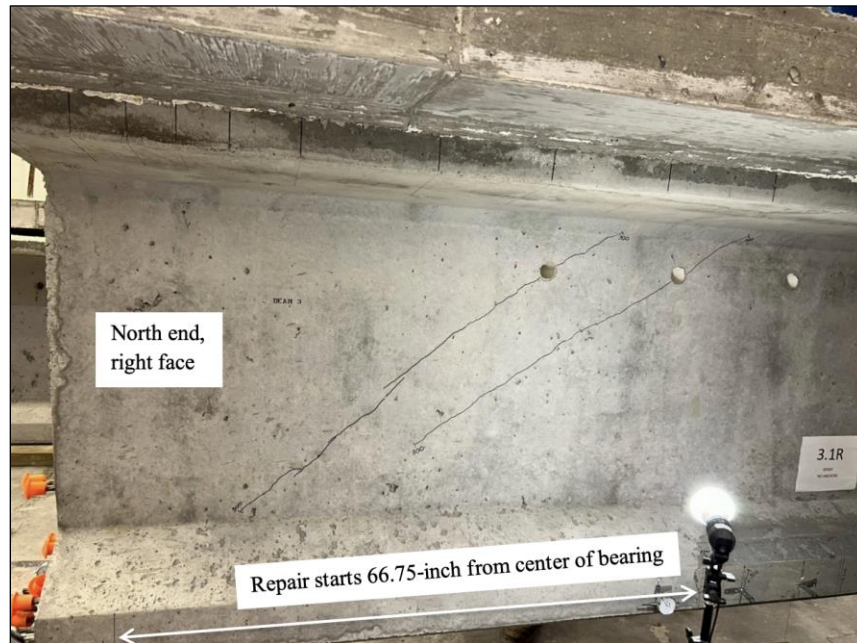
Photo. Test 3.1.S (repair 3.1RBF, 3.1LBF) initial shear cracks (right face of girder pictured).
